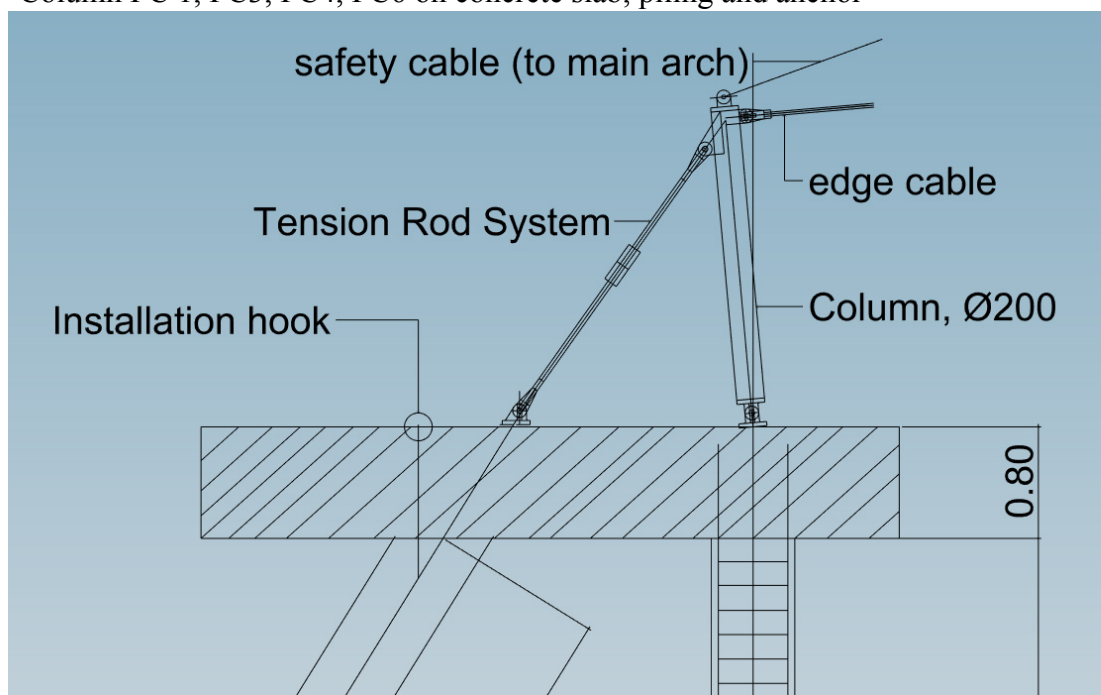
foundation slab at columns FC1, FC3, FC4, FC
